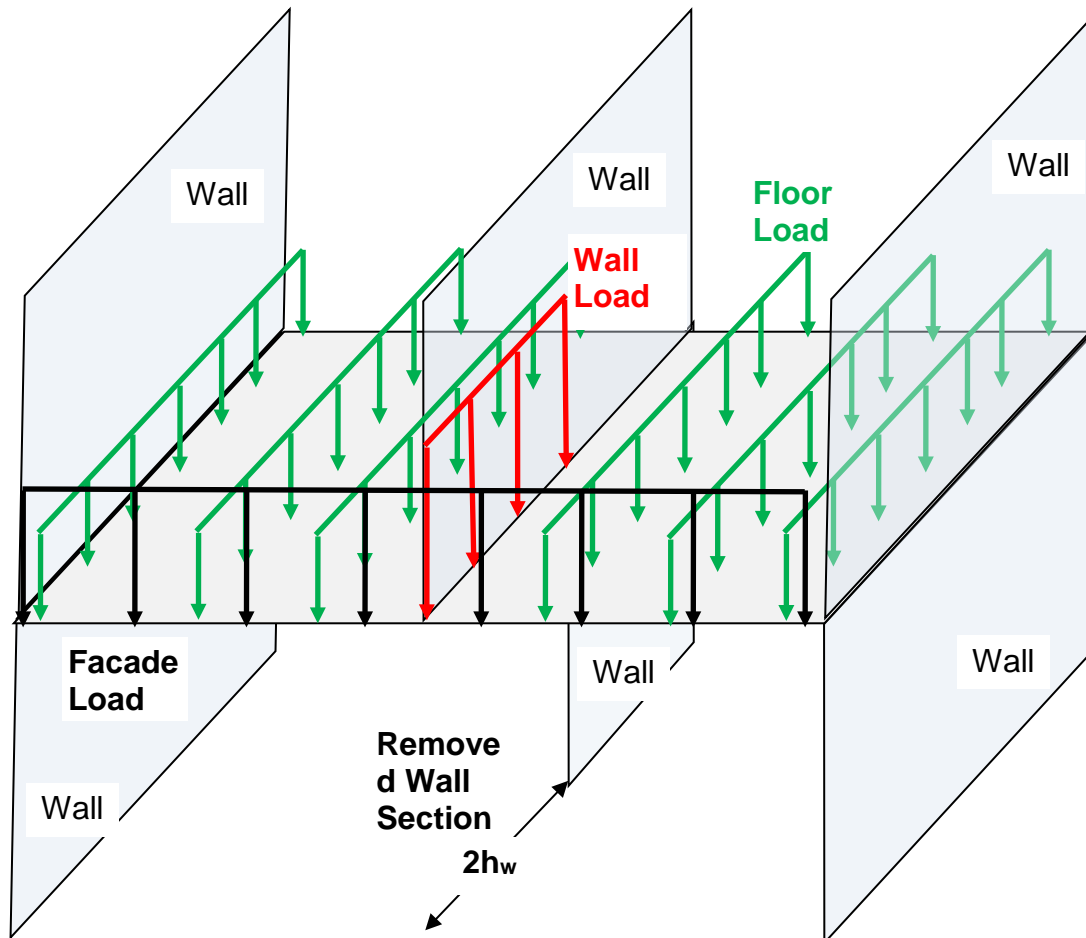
Plan View of One-way Load-bearing Wall Structure
